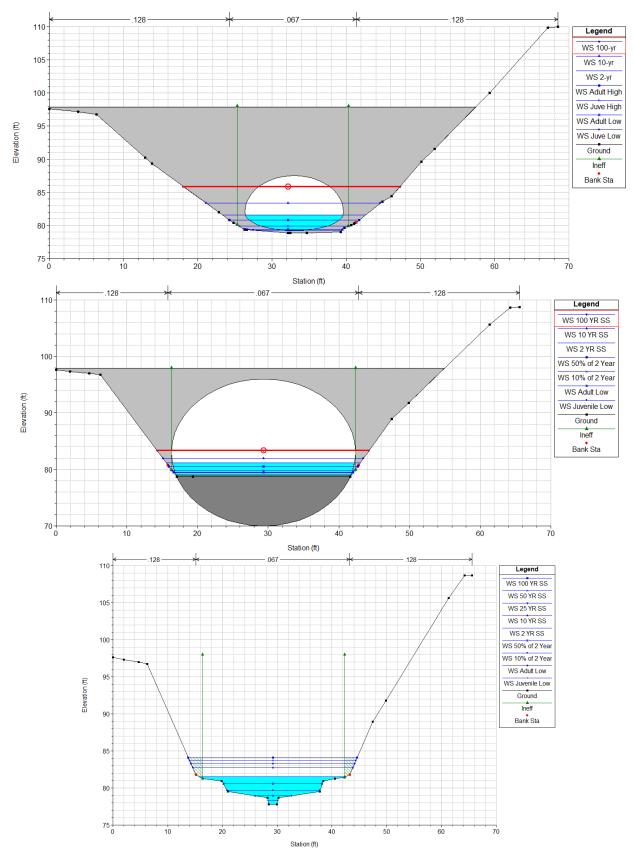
HEC-RAS inlet cross sections for existing (top) and proposed (middle/bottom) conditions
